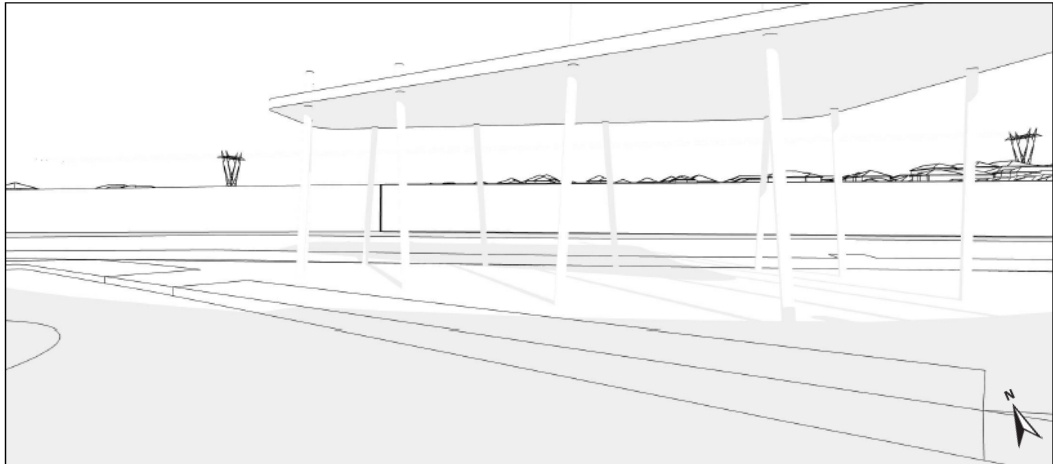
Existing view looking east from Howard Park (Source Bennett and Trimble) Not to scale
